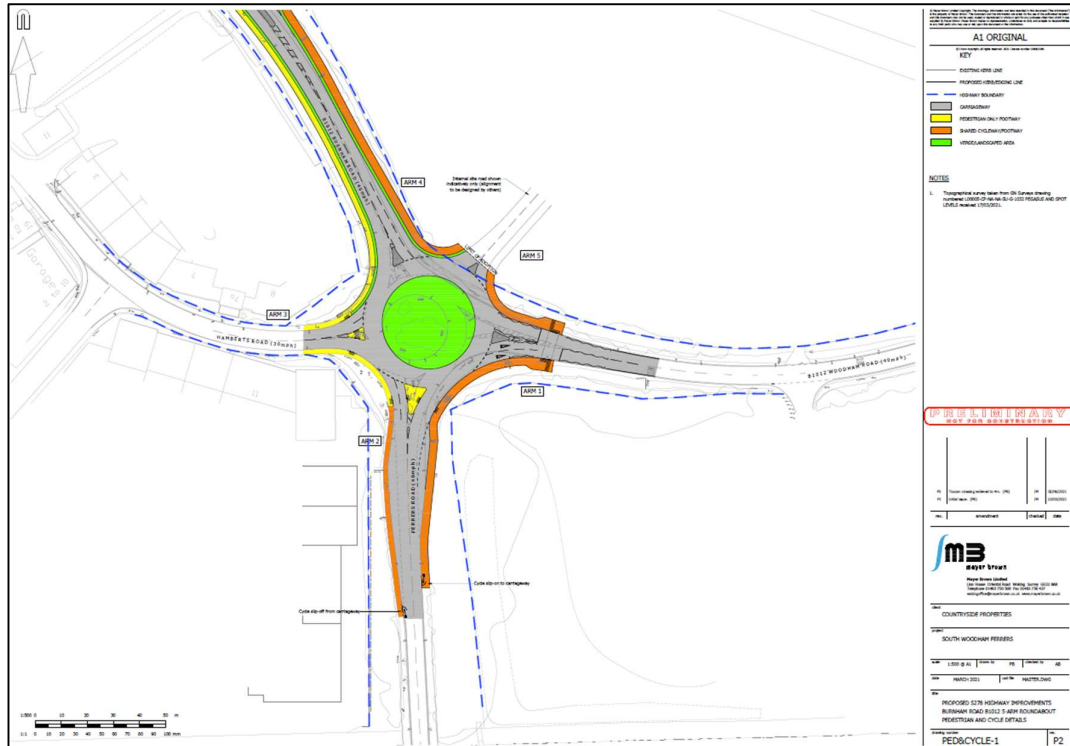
Proposed Burnham Road/Ferrers Road/Woodham Road/Site Access Roundabout
